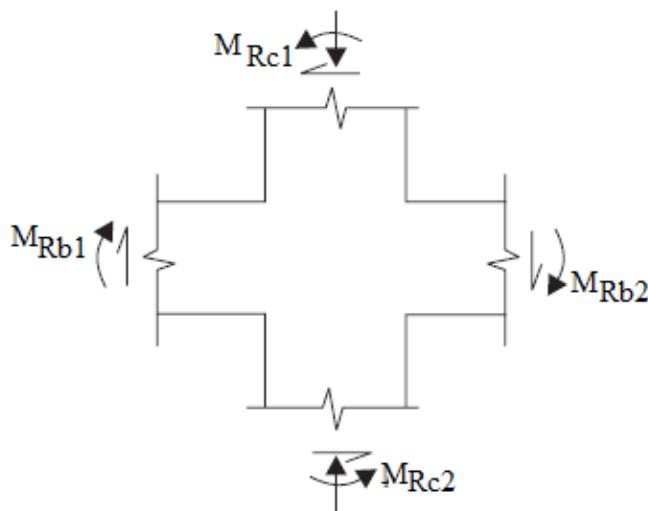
Strong Column-Weak Beam Concept in Interior Beam Column Joint.
